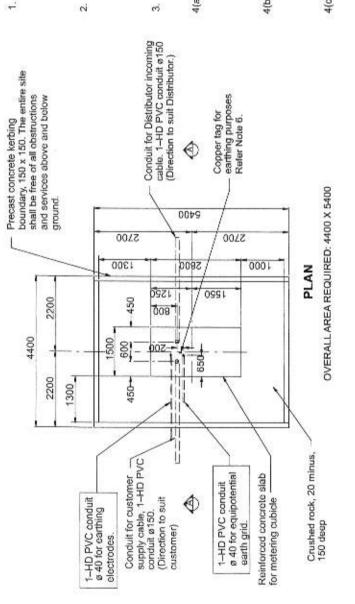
H.V. Metering Structure - Foundation and Support Details for Meter Box
